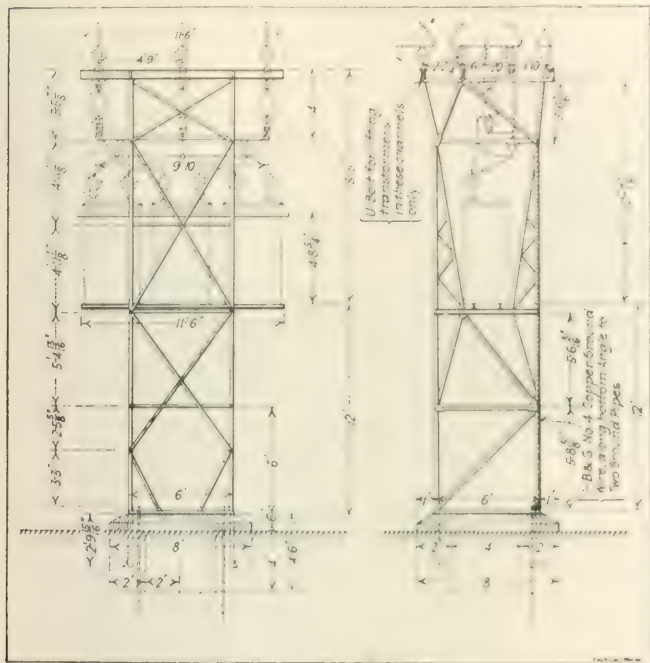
STEEL SUPPORT AND FOUNDATION FOR OUTDOOR TRANSFORMERS
